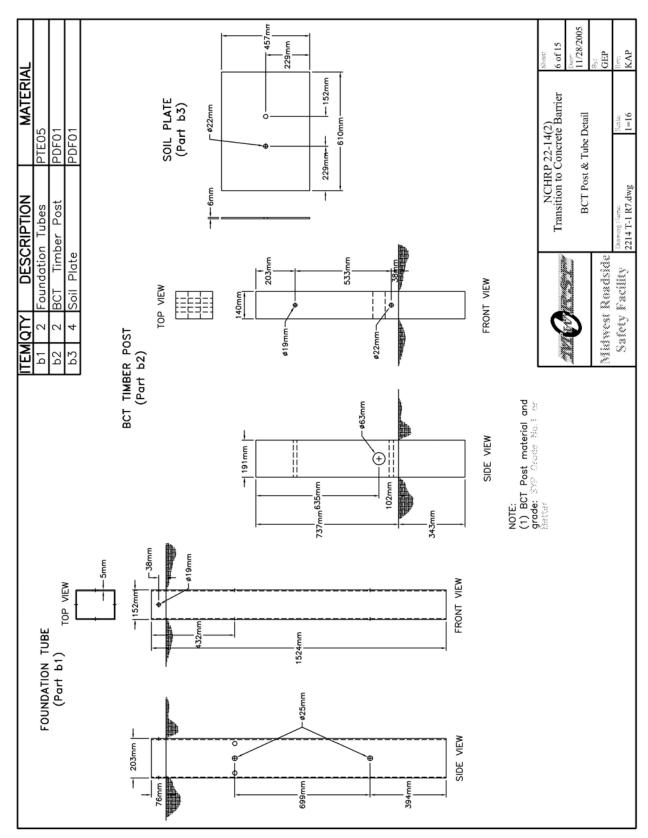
Approach Guardrail Transition to Concrete Barrier Design - Anchorage Details
